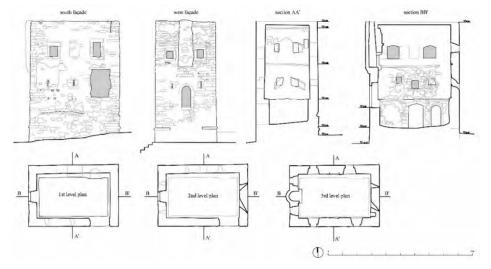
Architectural survey of the tower-house, some drawings (Emma Maglio, 2016).
